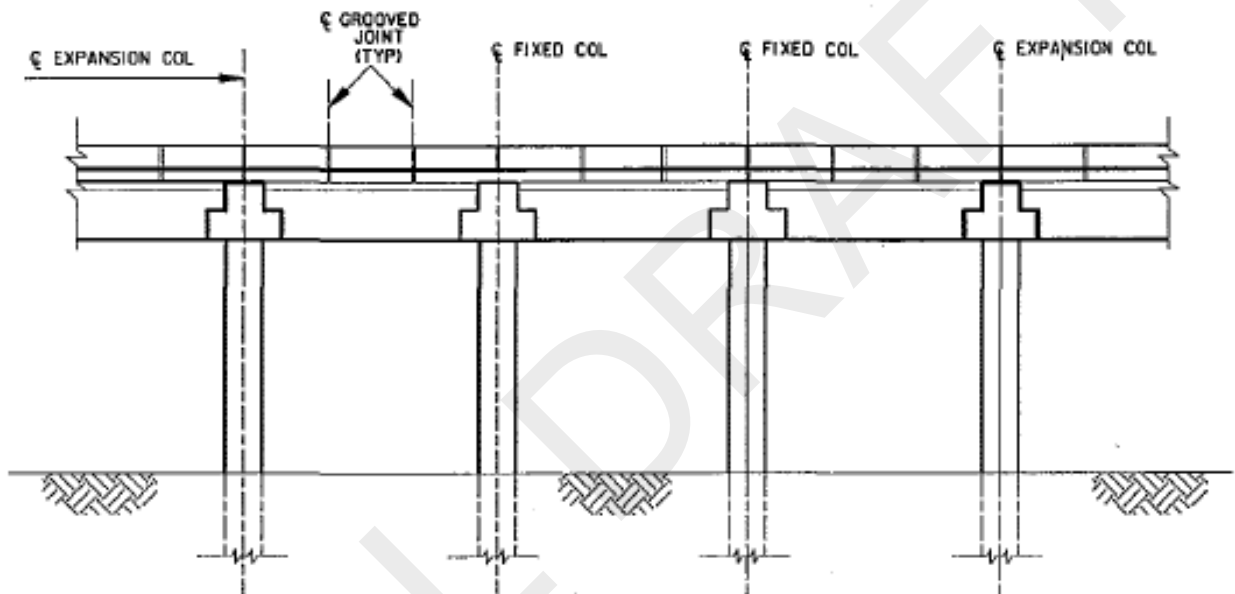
Typical Tee Beam Unit Elevation – 3 Continuous Spans
